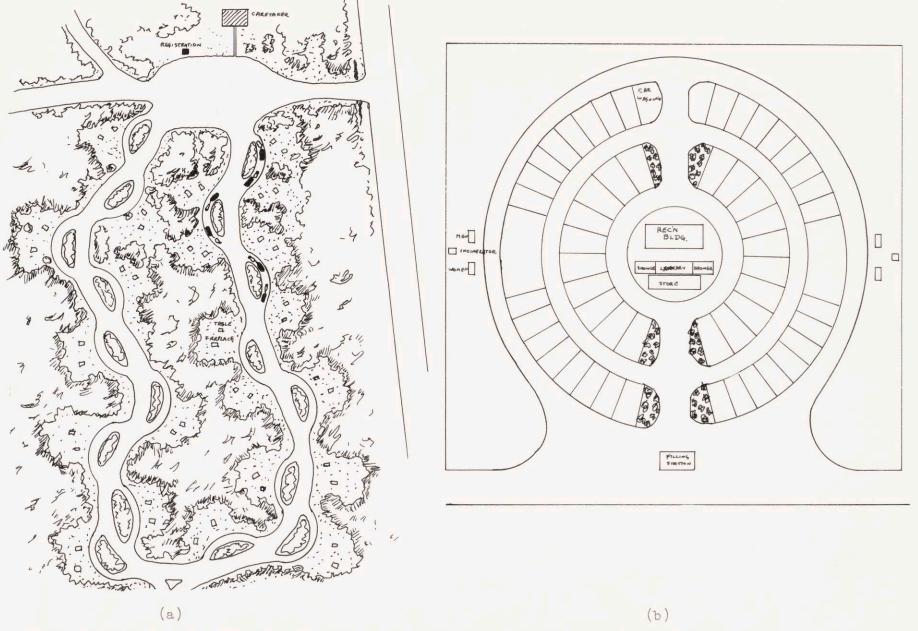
(a) New York Plan for Trailer Park, from The Trailer Park, 1941, p.8.
